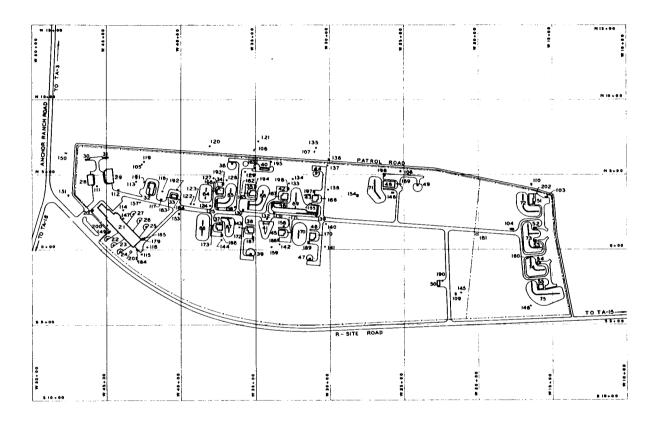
Structure Location Plan for TA-9 - New Site Replacing Anchor East (1955 Drawing from the LANL Technical Area Structure Location Plans)
